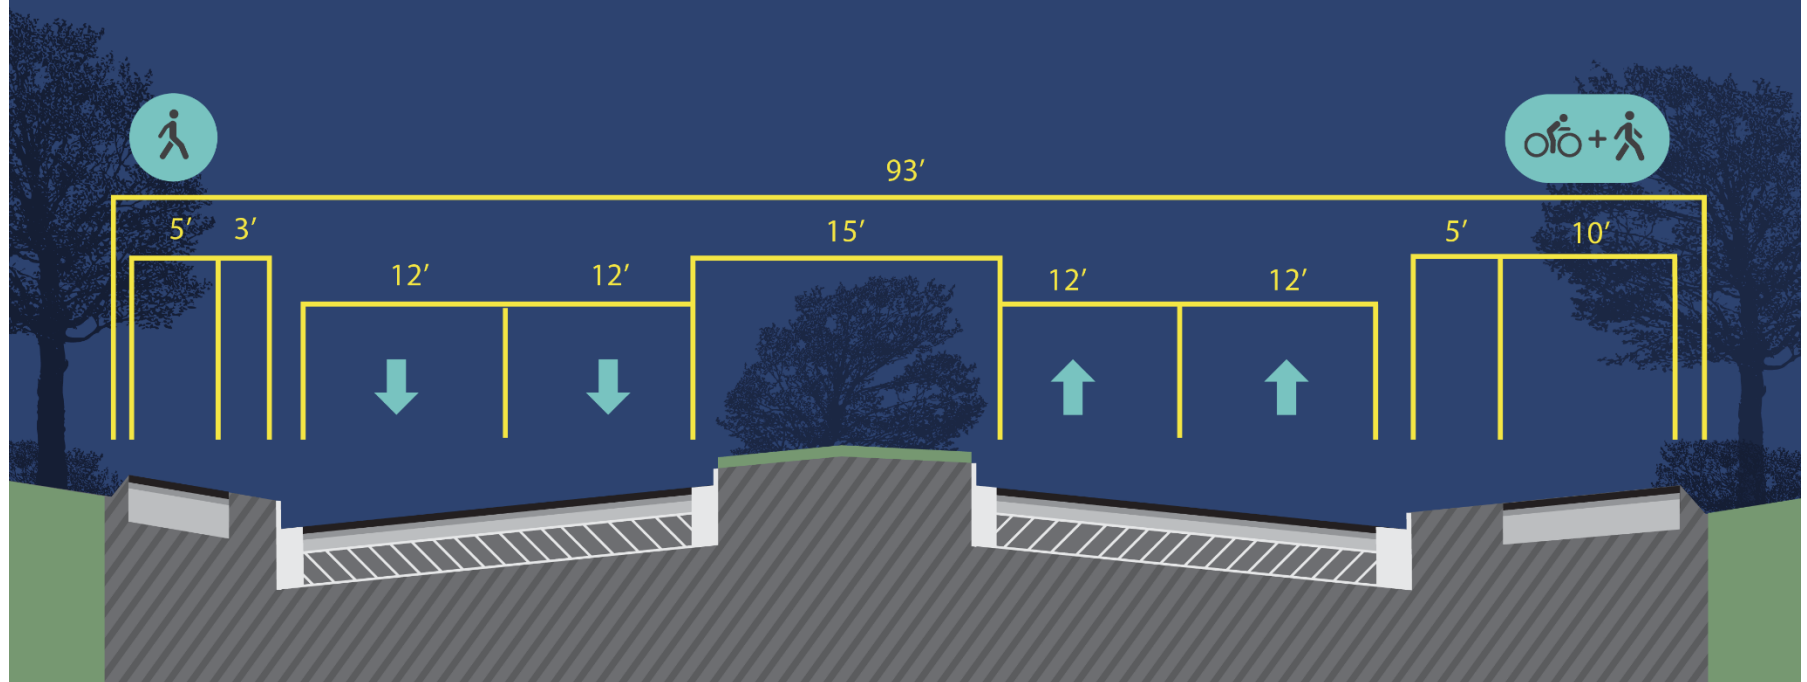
SC 41 Proposed Typical Section between US 17 and Joe Rouse Road and from Dunes West Boulevard to Clements Ferry Road
